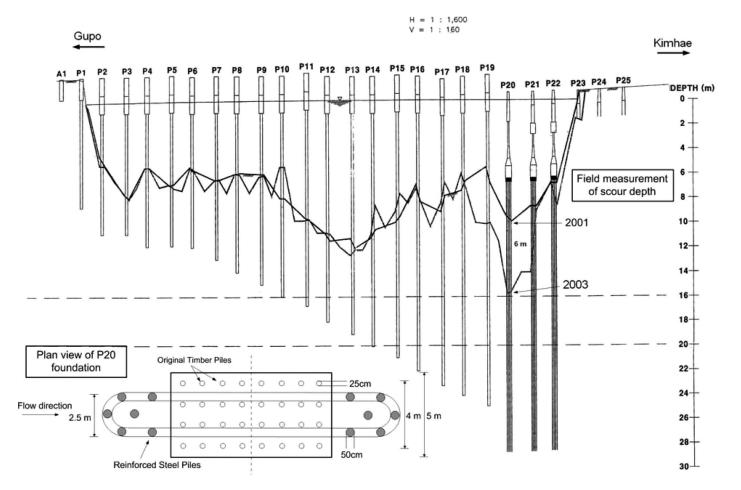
Cross sections surveyed in 2001 and 2003 (after Typhoon Maemi) and plan view of P20 at the Old Gupo Bridge
